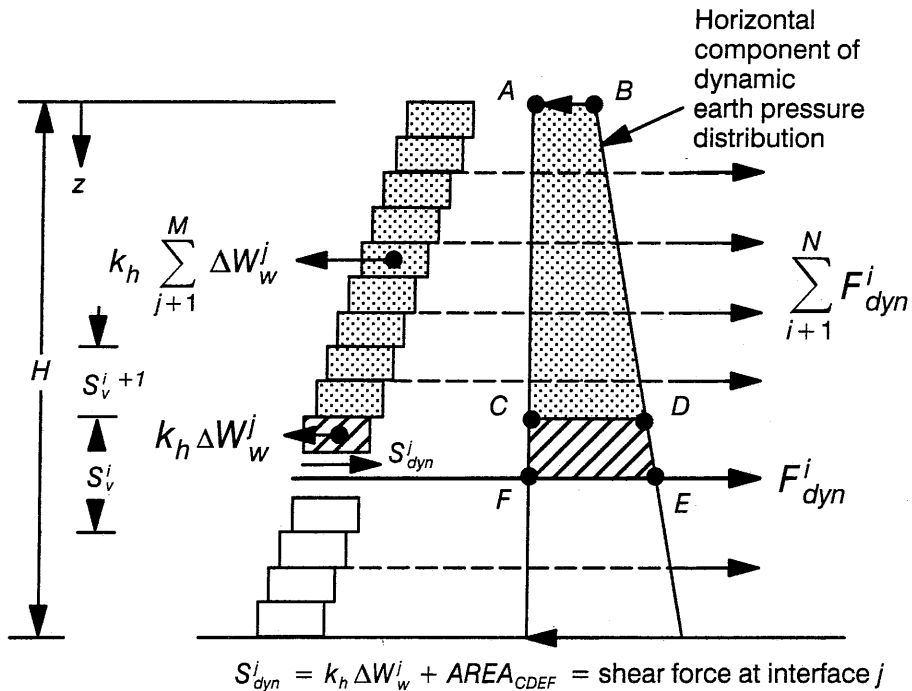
Calculation of dynamic interface shear force acting at a reinforcement elevation. (Notes: N = total number of reinforcement layers; and M = total number of facing units.)
